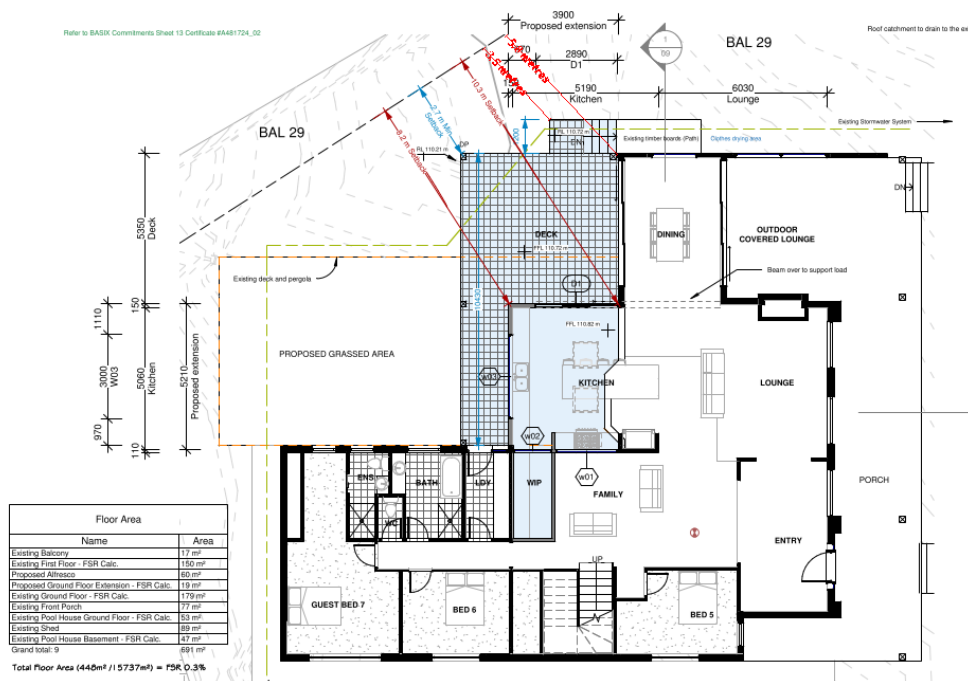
Plan Extract – Proposed Setbacks at No. 7 Dendrobium Crescent
